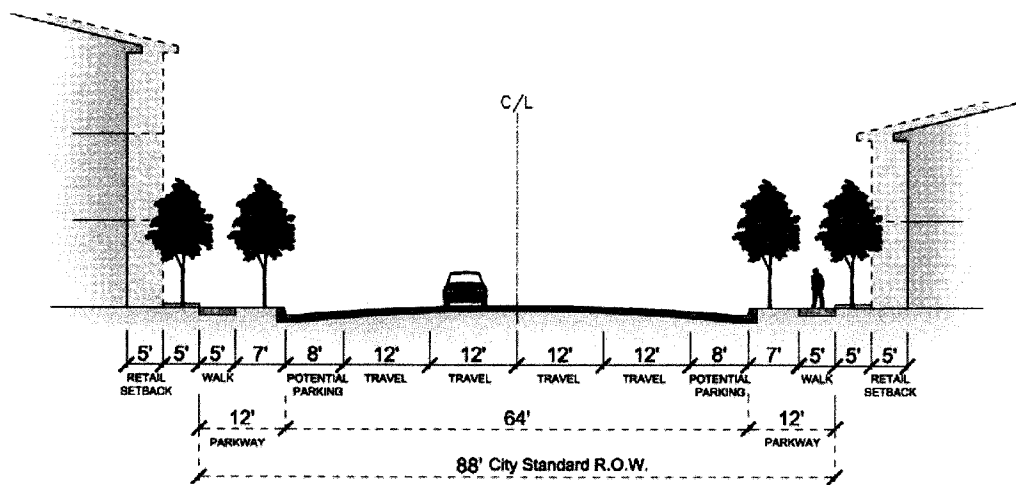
Modified Secondary Highway Conceptual Cross-Section B-B' (Menlo Ave.)
